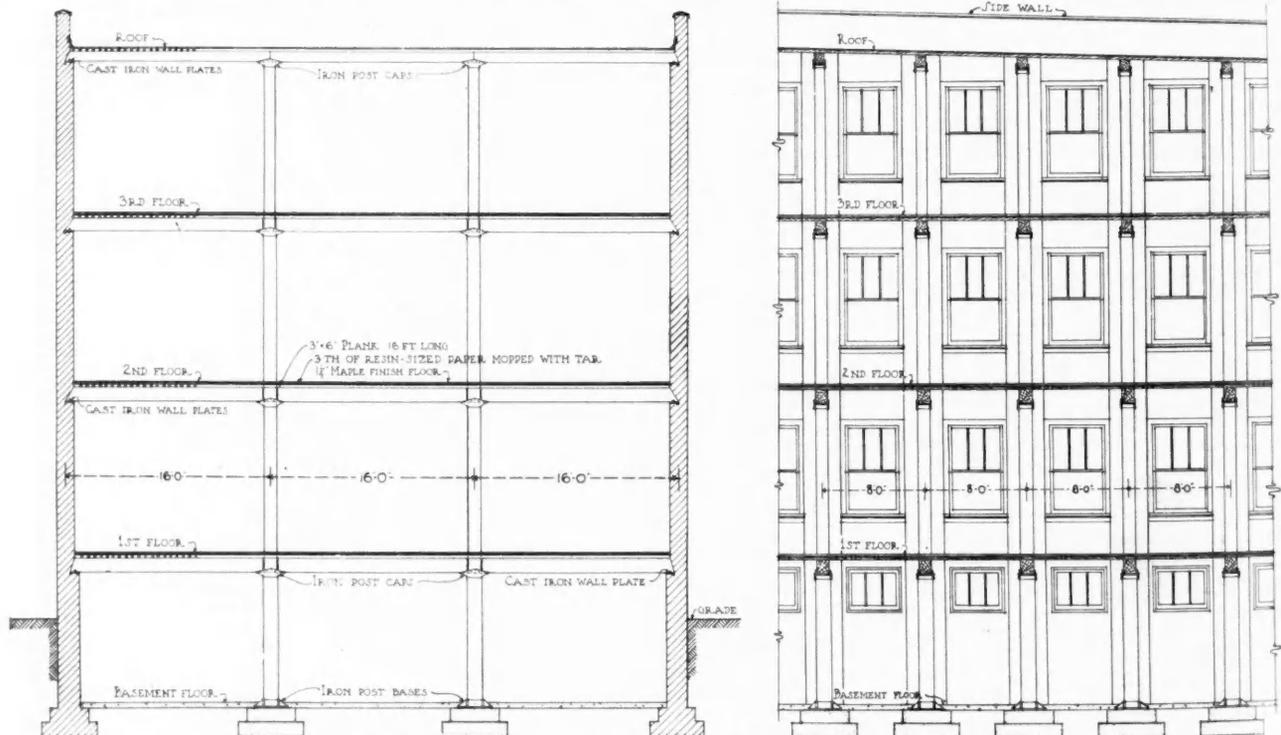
Two Views of Wooden Mill Construction Type of Commercial Building.
